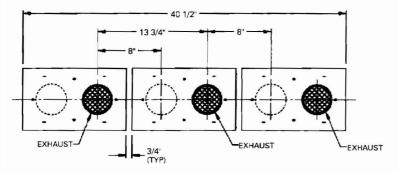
Multiple Stainless Steel Horizontal Vent Kit Installation – Front View
